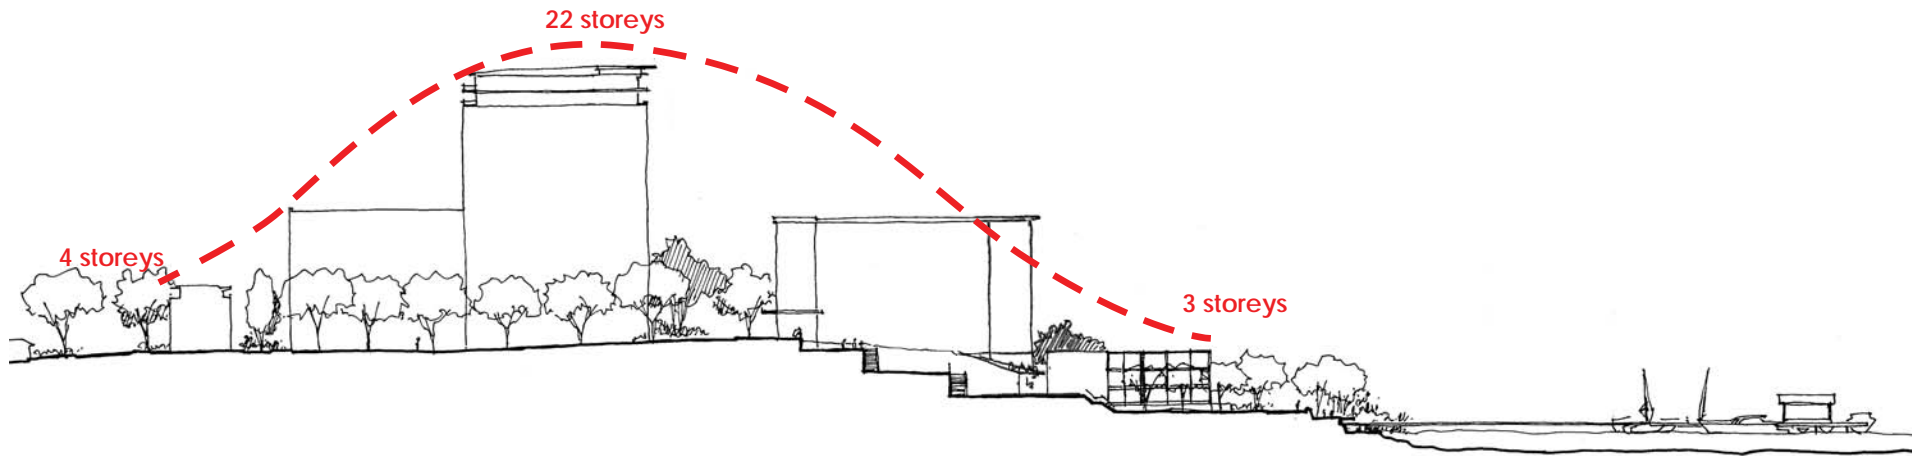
OPTION 2: HARBOUR VIEW CONCEPT - LONG SECTION THROUGH SITE DOWN TO WATER
